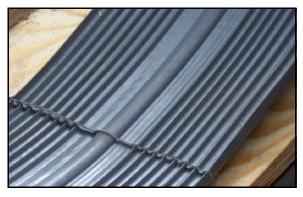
Typical waterstop used in conduit construction to prevent the movement of water through joints. The ends of this waterstop have been spliced together.
